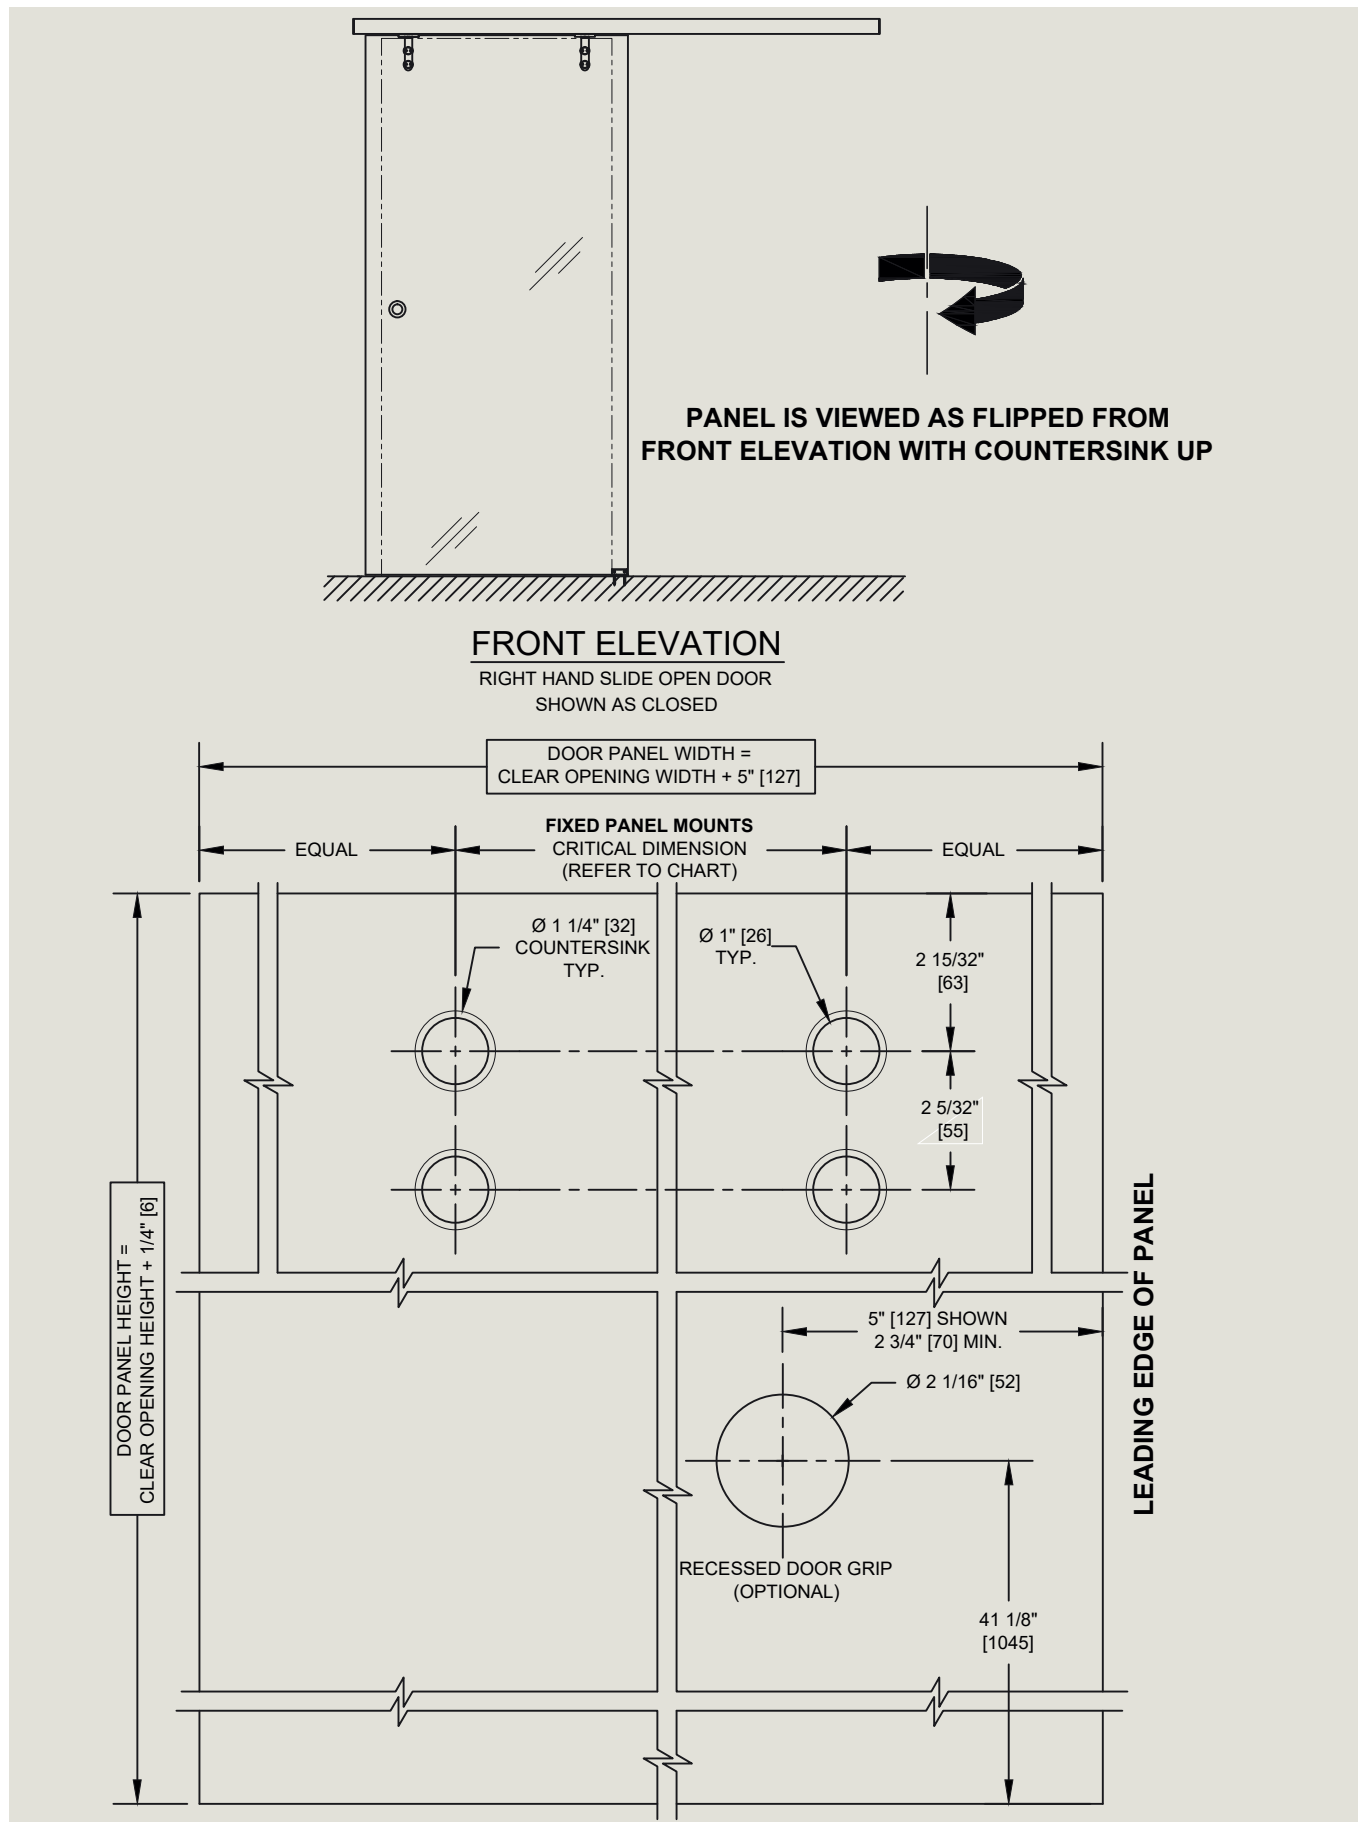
MAGNEO FIXED PANEL MOUNTS - Right hand slide open door, Optional recessed door grip
